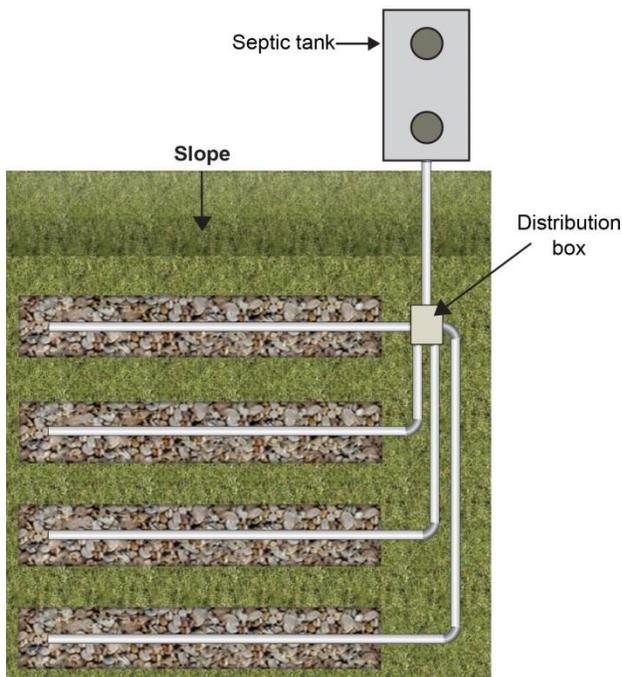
Overhead view of a distribution box layout on a sloped site.
